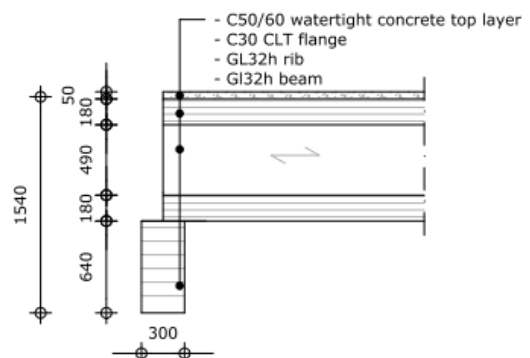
Floor design 3 glulam beam detail cross-section C-C maximum height in mm
